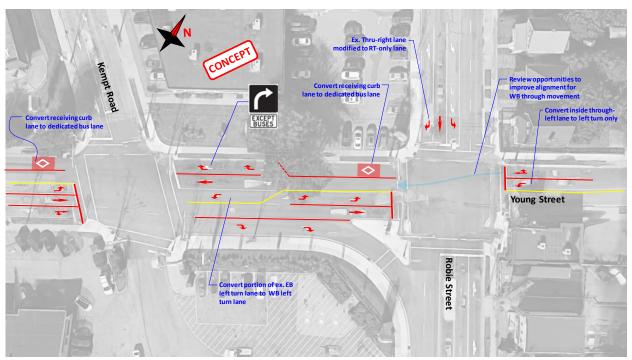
Proposed Configuration -- Young Street (Robie Street to Kempt Road)
